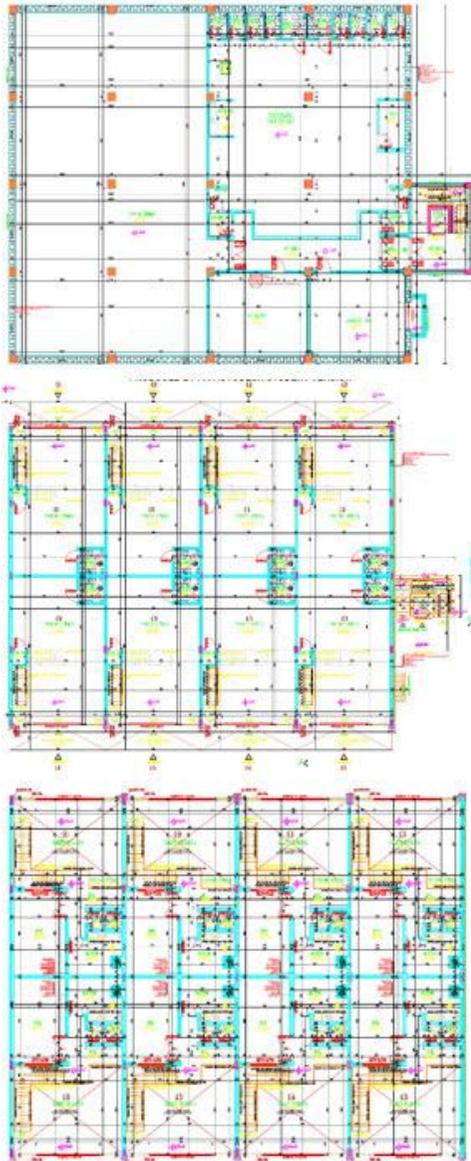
Basement, Ground and Mezzanine Floor Plans.
